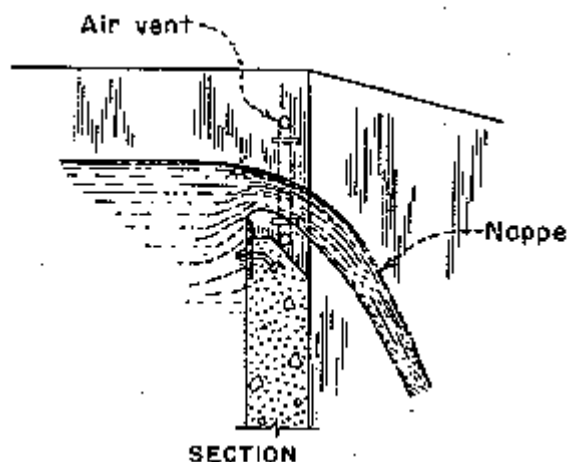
Section through suppressed weir with air vent in wall.
